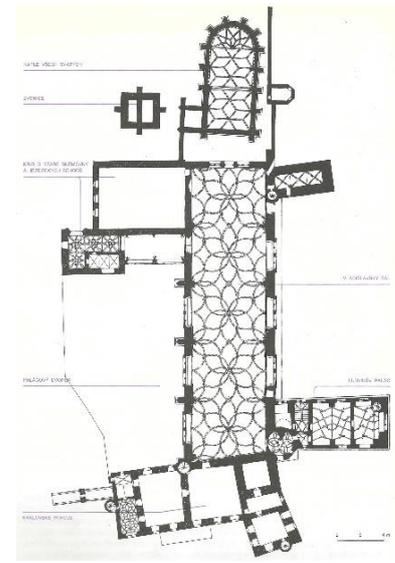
Floor plan of the royal palace after reconstructions carried out under Vladislav II. [3], page 83
